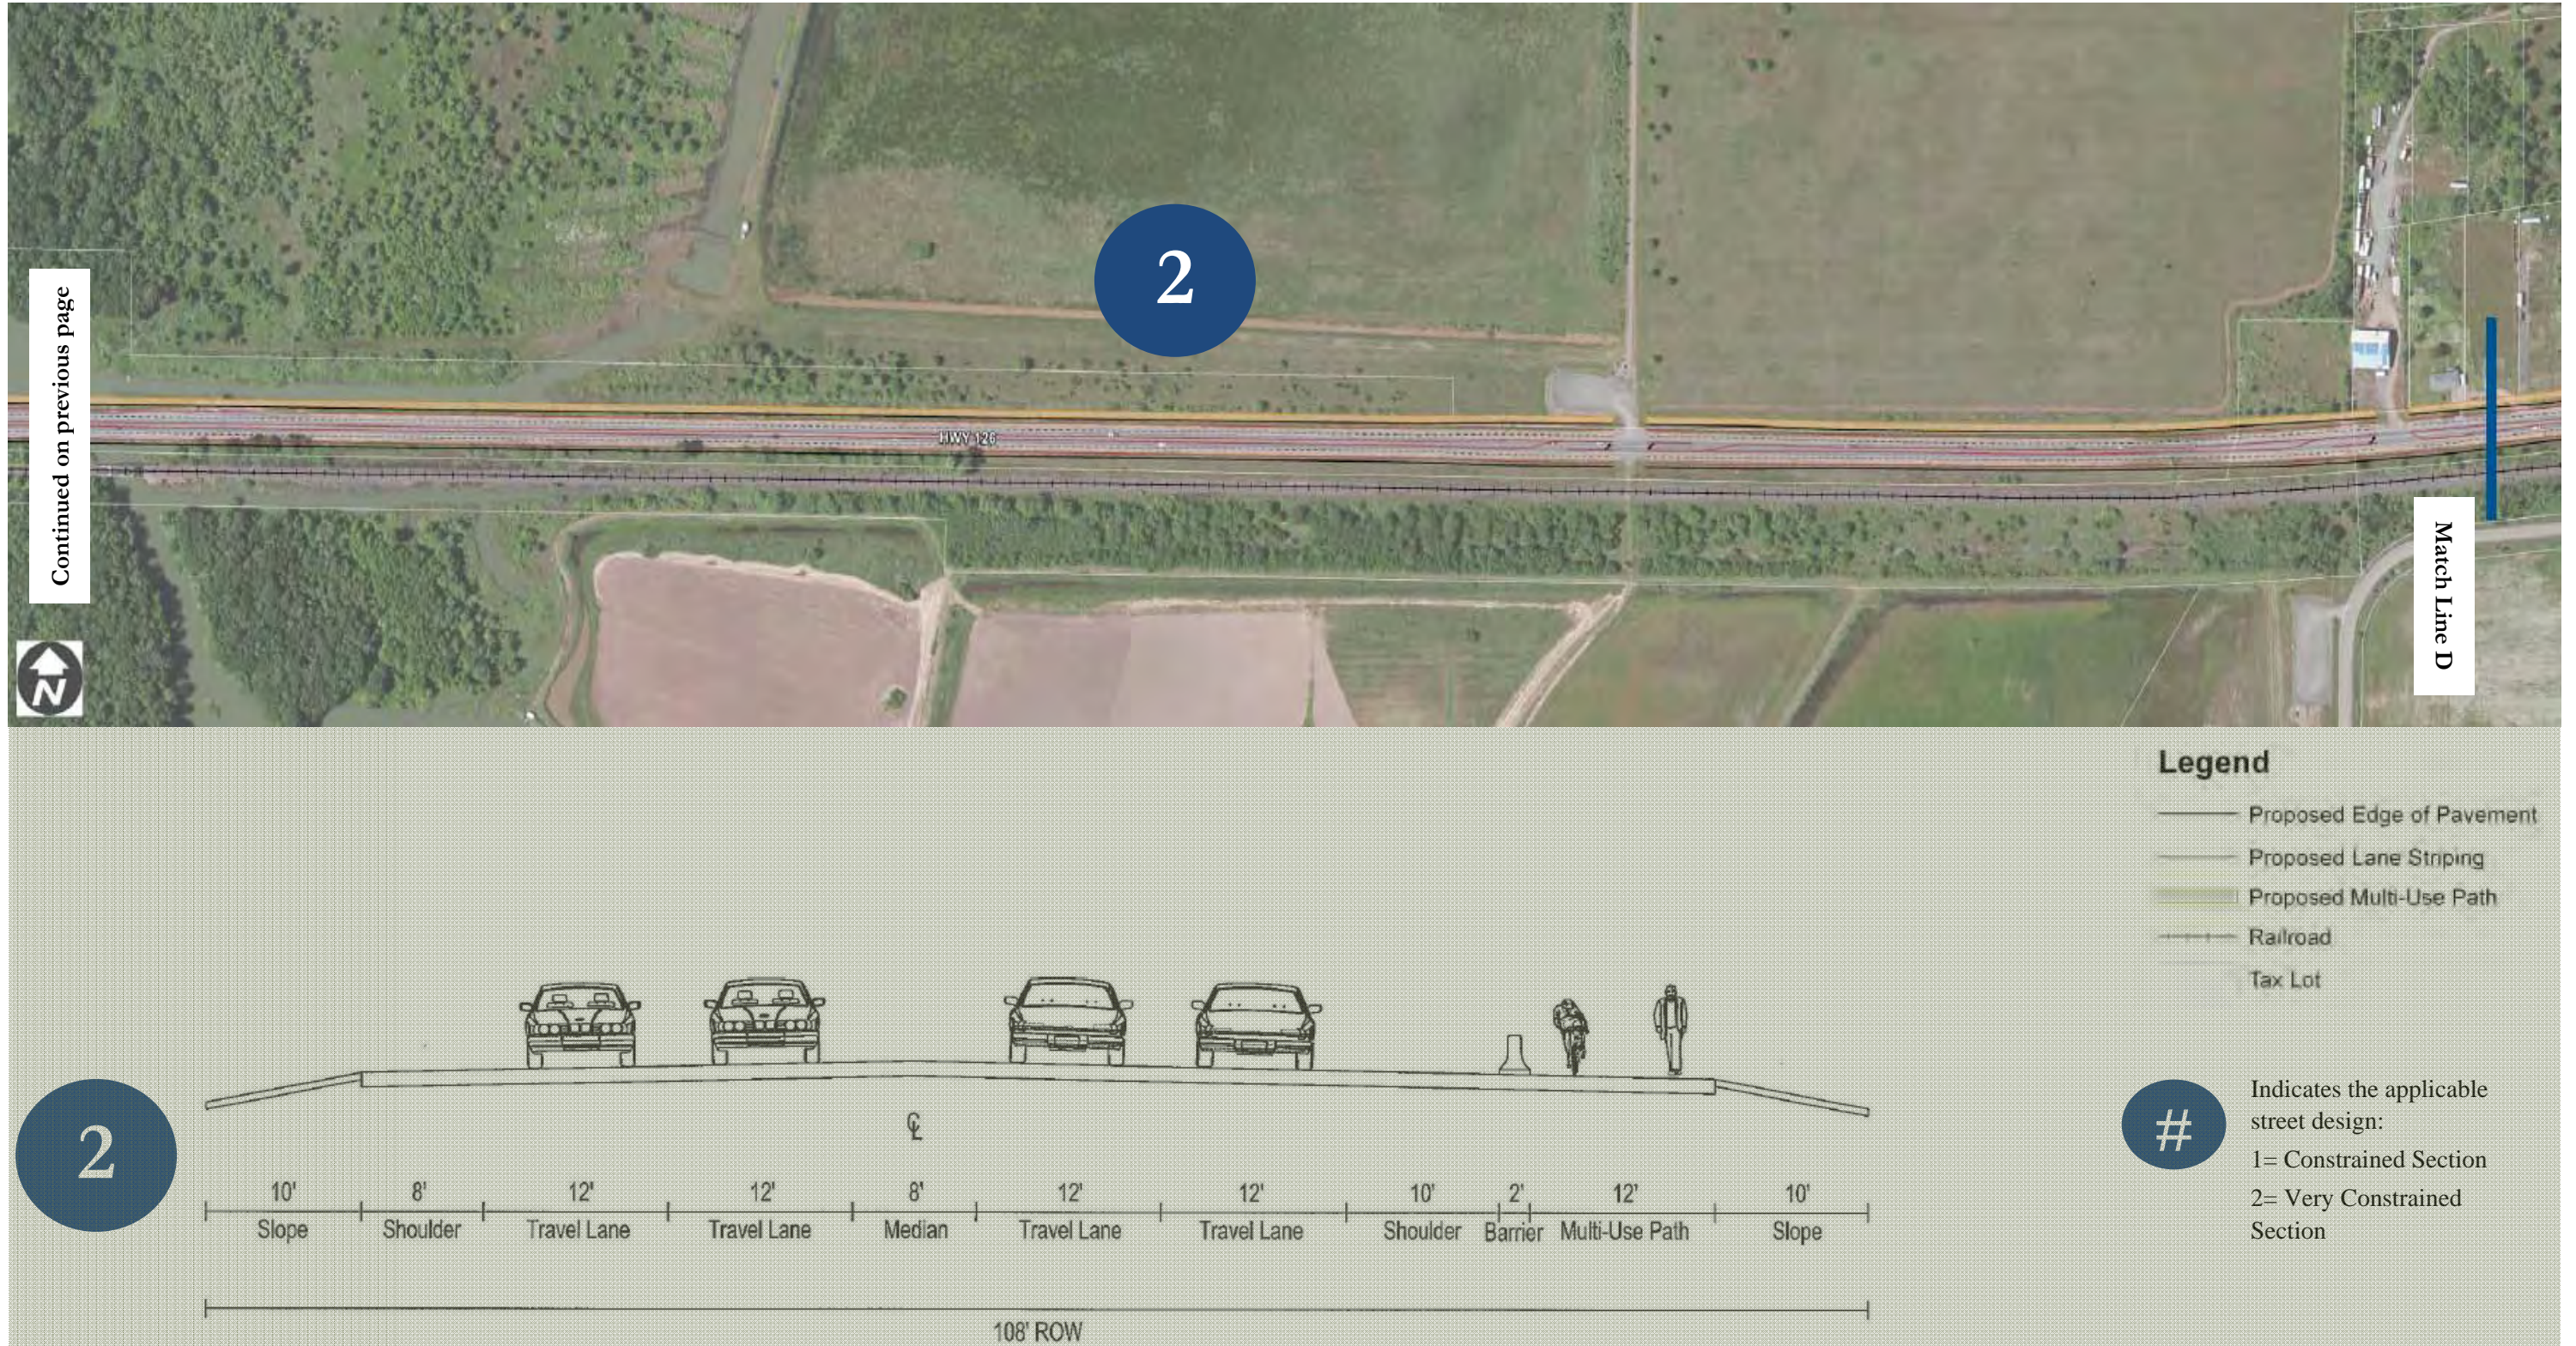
Recommended Corridor Plan: West of Fisher Road to east of Richmond Street
